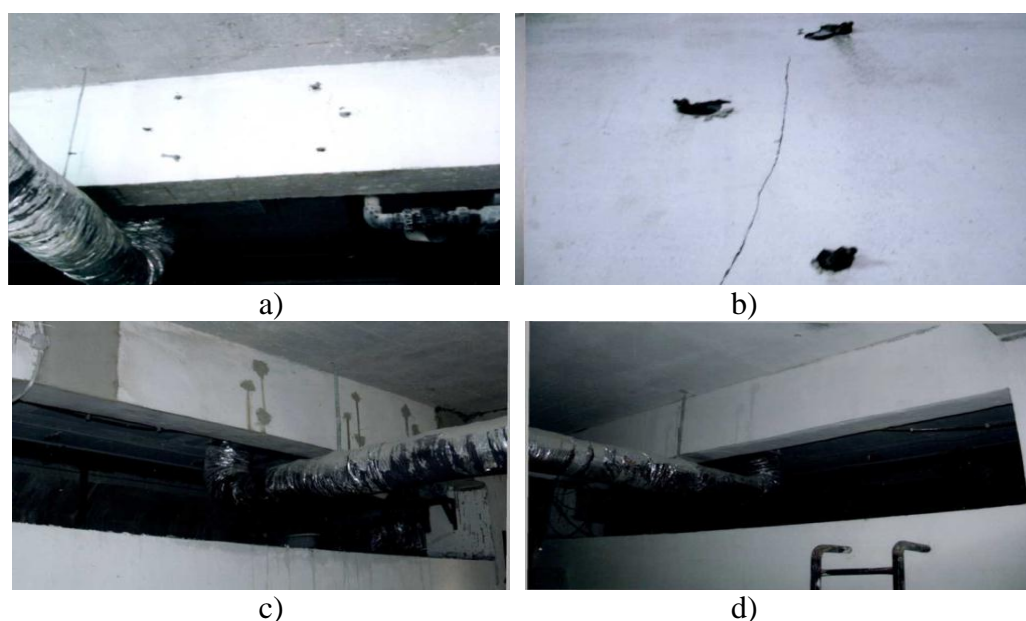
The destruction of a reinforced concrete crossbar beam on the pool of the Prykarpatye hotel in Truskavets (2006): a – a general view of the location of the packers; b – crack and packers, a close view; c – a view of the crossbar after dismantling the packers; d – a view of the crossbar after completing injection works
